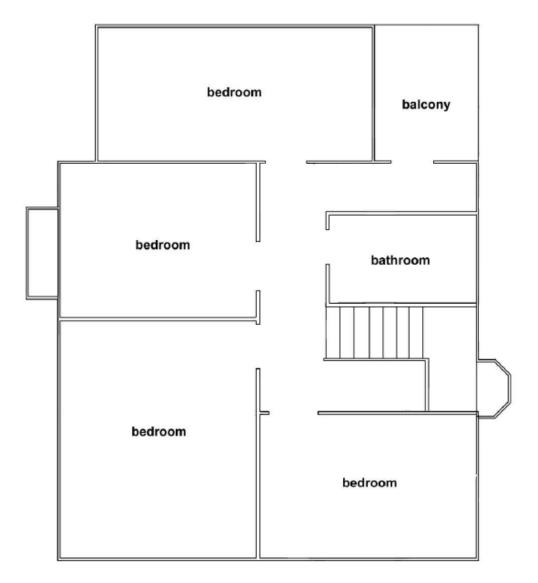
Second Floor Plan (CHC Limited 2017: 14)
